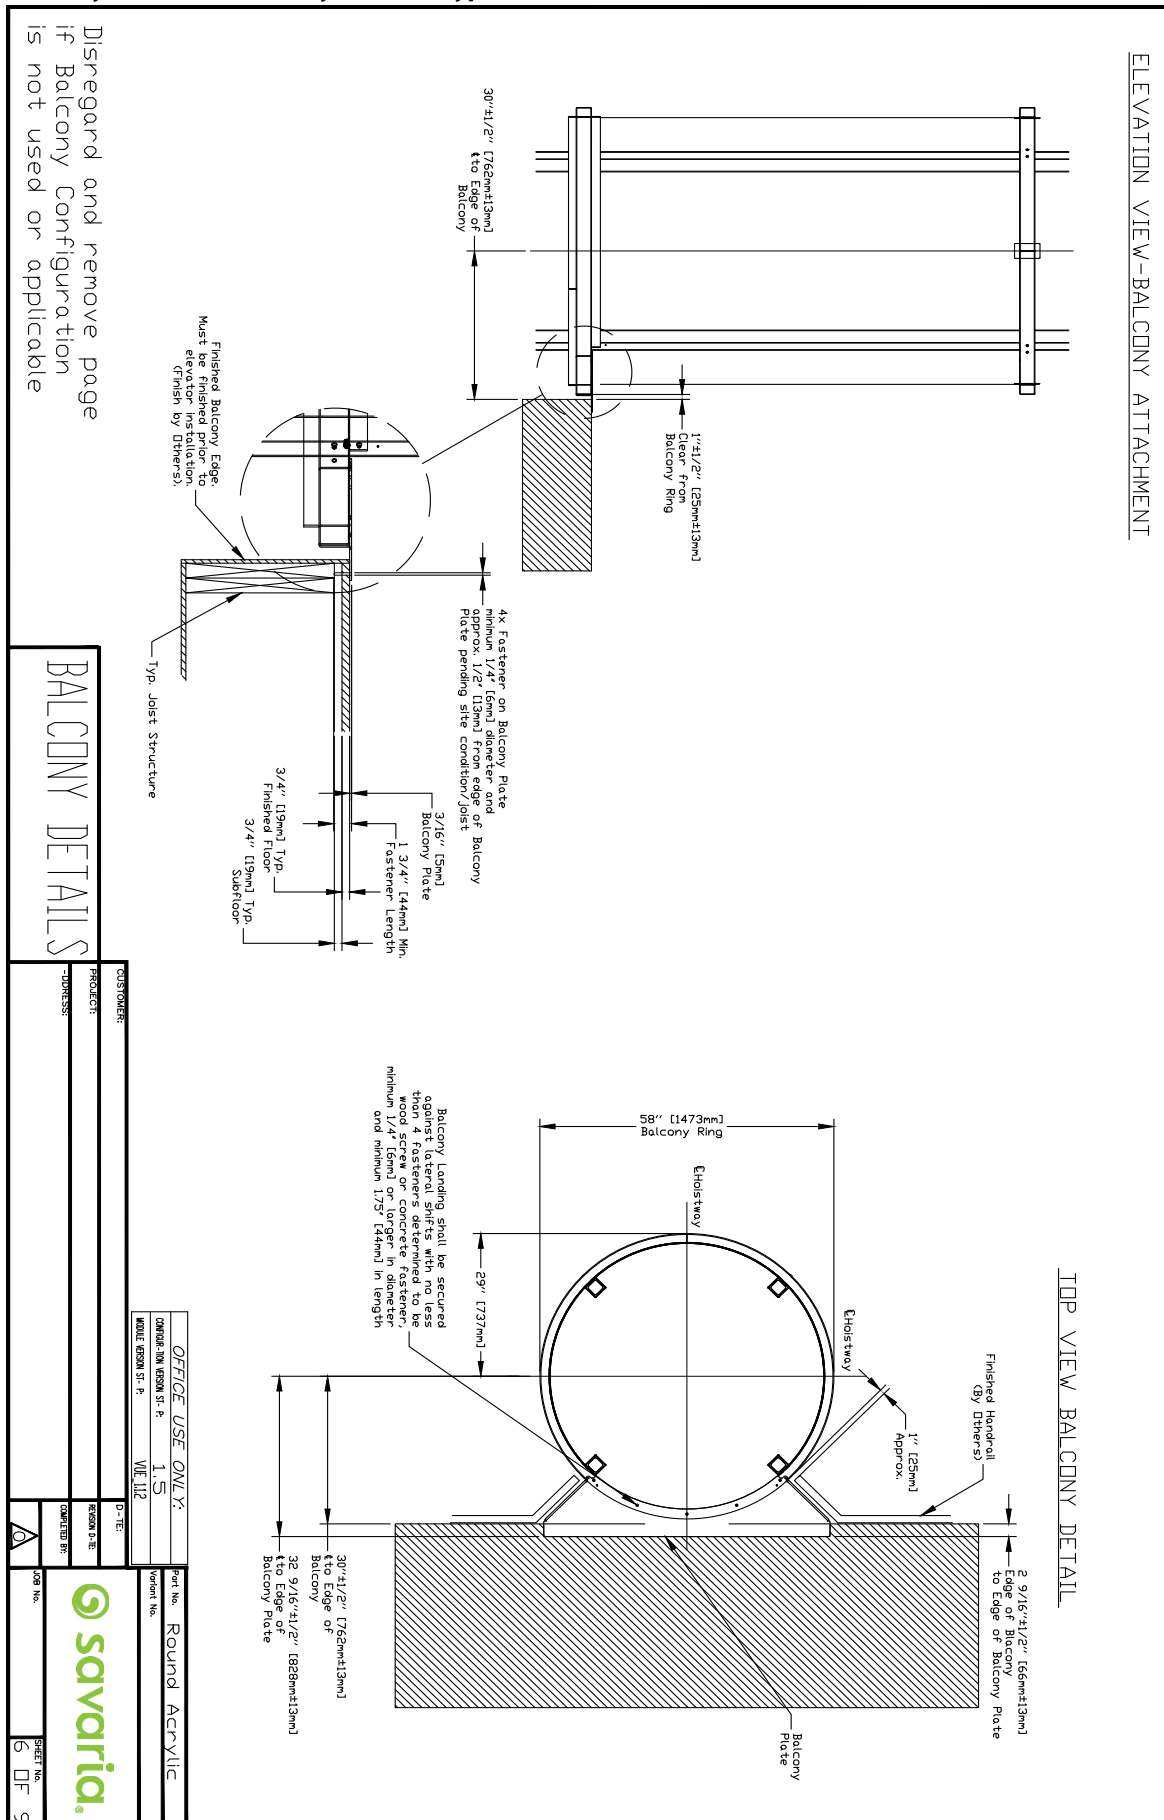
Balcony details- round acrylic (RAM) type 1, 2 or 3
